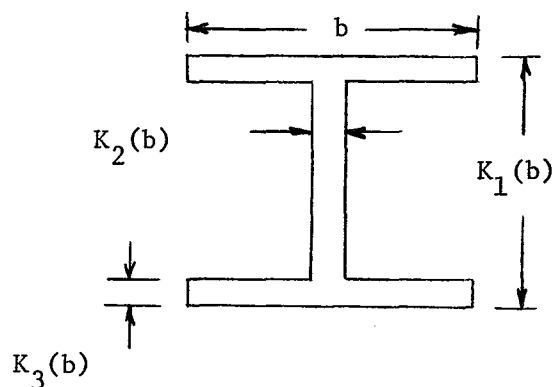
WIDE-FLANGE CROSS SECTION
